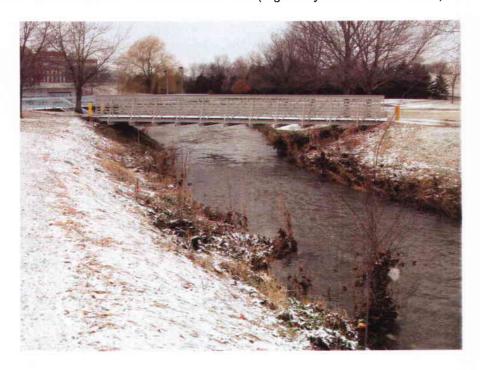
Downstream Side of Pedestrian Bridge (looking east)
